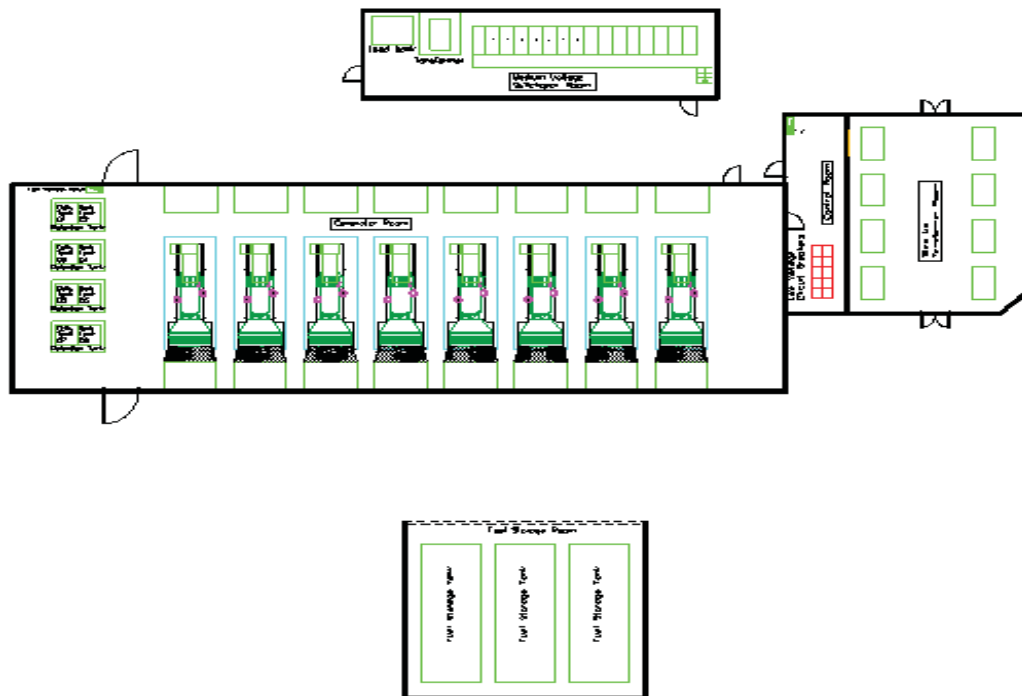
Port of Beirut Power Plant Buildings [22]
